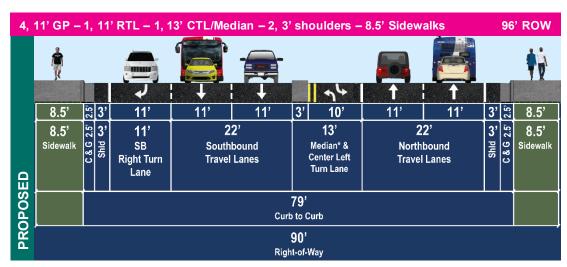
Short-Term Recommended Cross Section for Milton Road Segment Q
